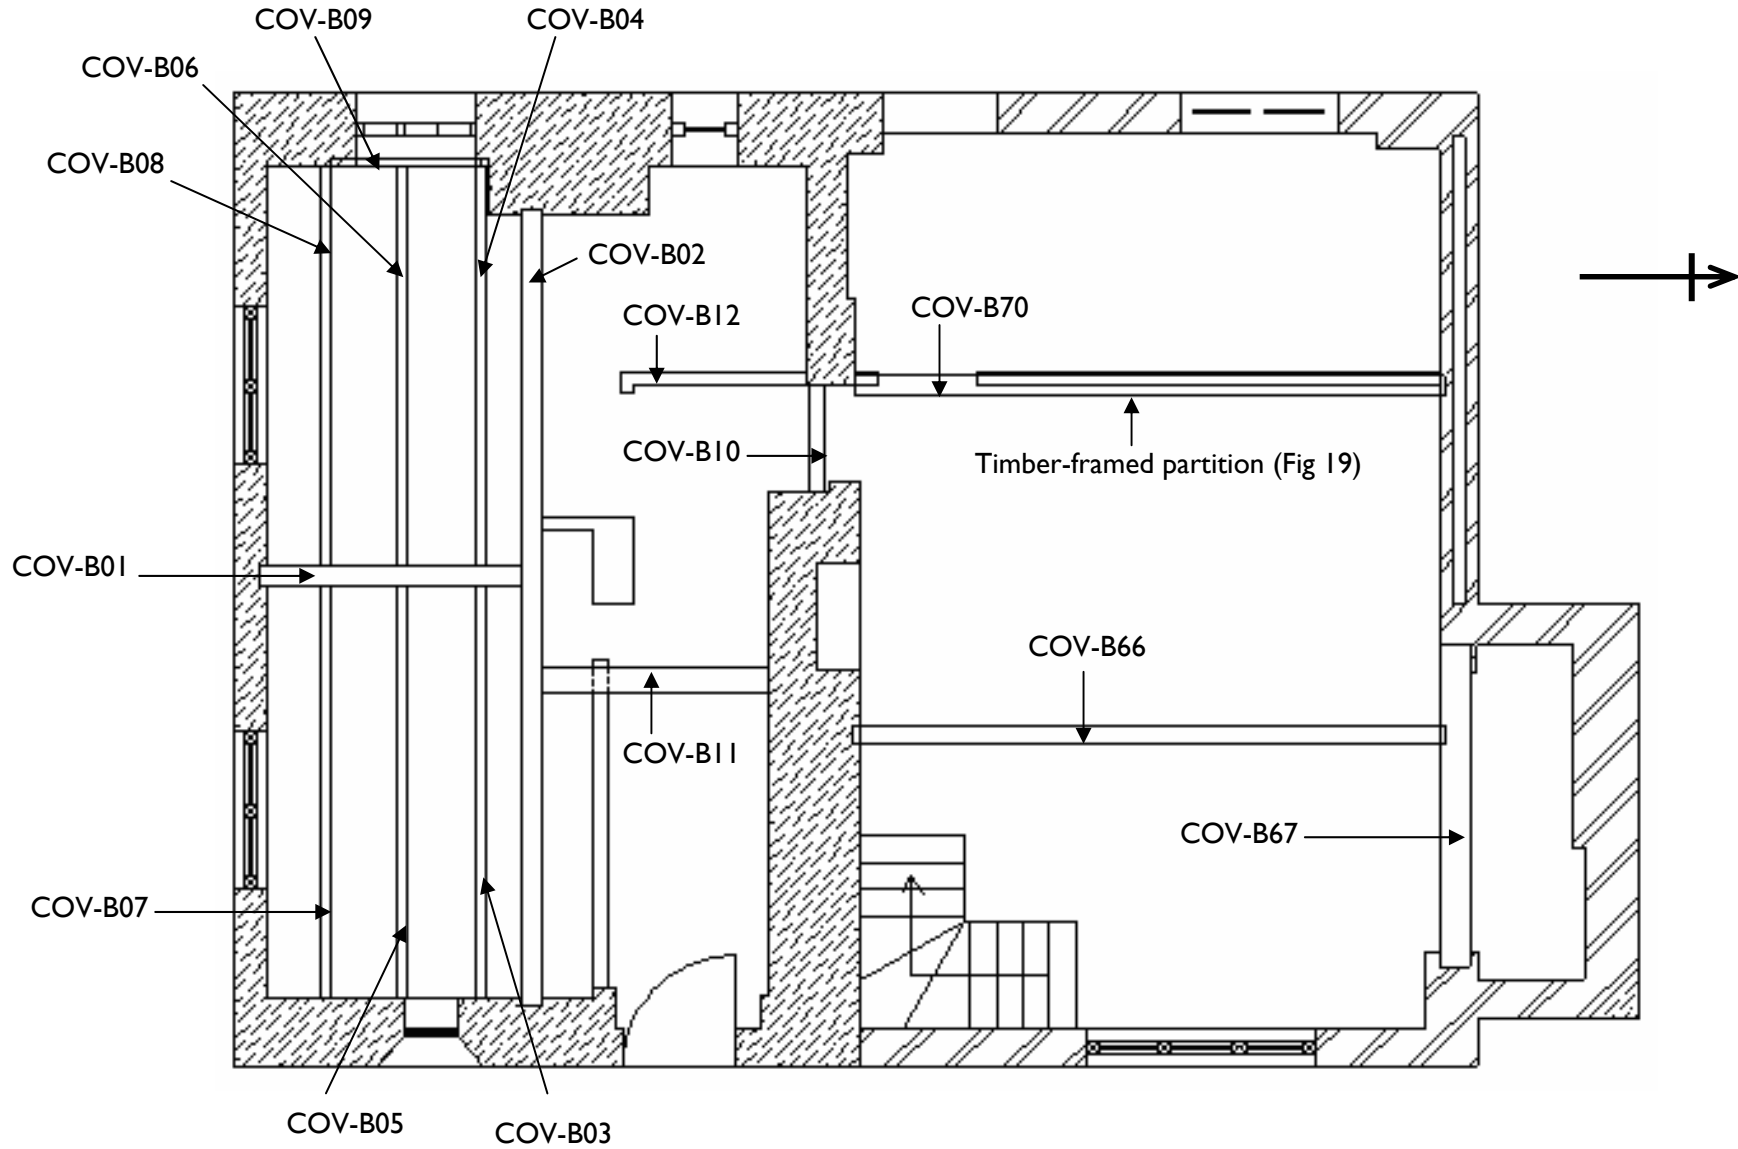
Cromwell Cottage; ground-floor plan, showing the location of samples COV-B01–12 and COV-B66, COV-B67, and COV-B70 (Frank W Haywood & Associates)
